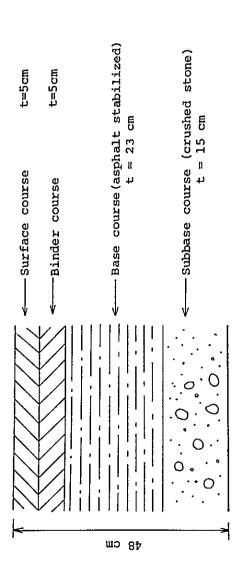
Cross section of the pavement of Jagorawi toll road
